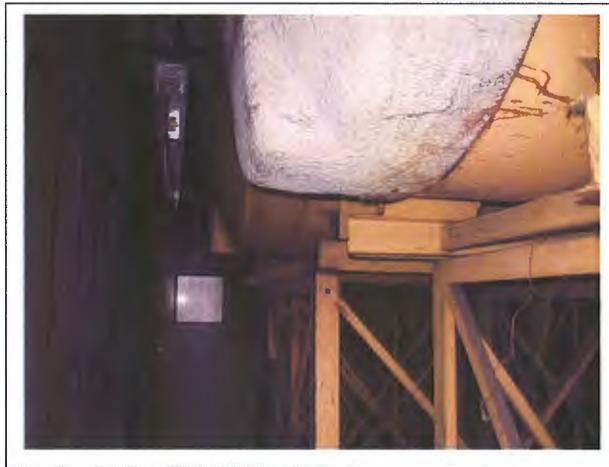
Chemical Storage House adjacent to the Hog Fuel Boiler House.
